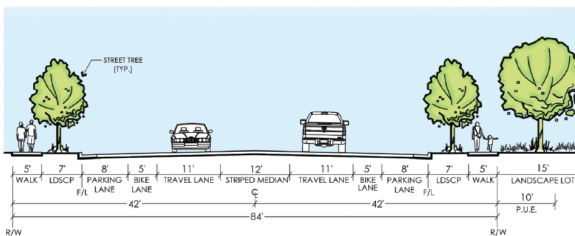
E. REDWOOD ROAD (WEST OF MOFFETT ROAD)
